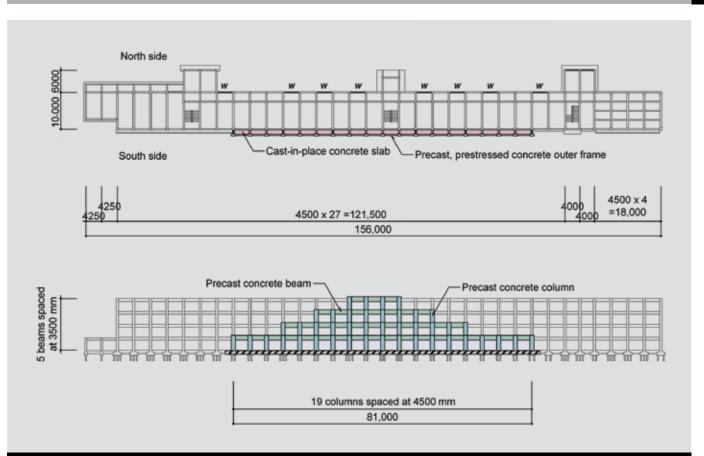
Junior high school building retrofitted by exterior frame method and reinforced concrete shear walls. Plan of the second floor and elevation view. Note: All measurements are in millimeters. W = installed reinforced shear wall. 1 mm = 0.0394 in.
